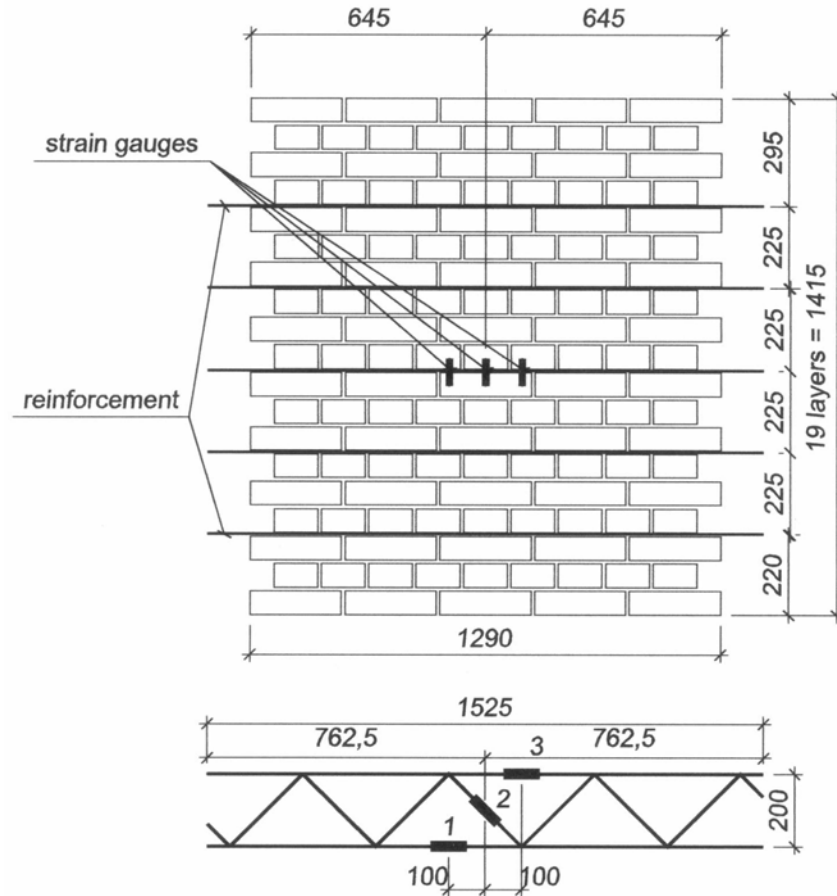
Reinforcement location in five bed joints of each reinforced masonry wall
